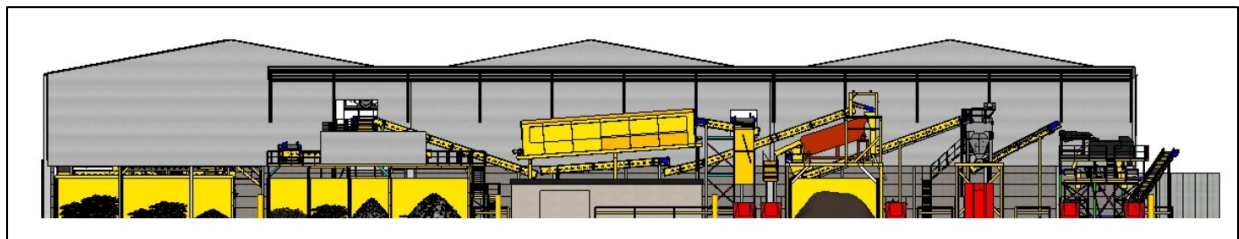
proposed view across rear / southern elevation of mechanised processes
